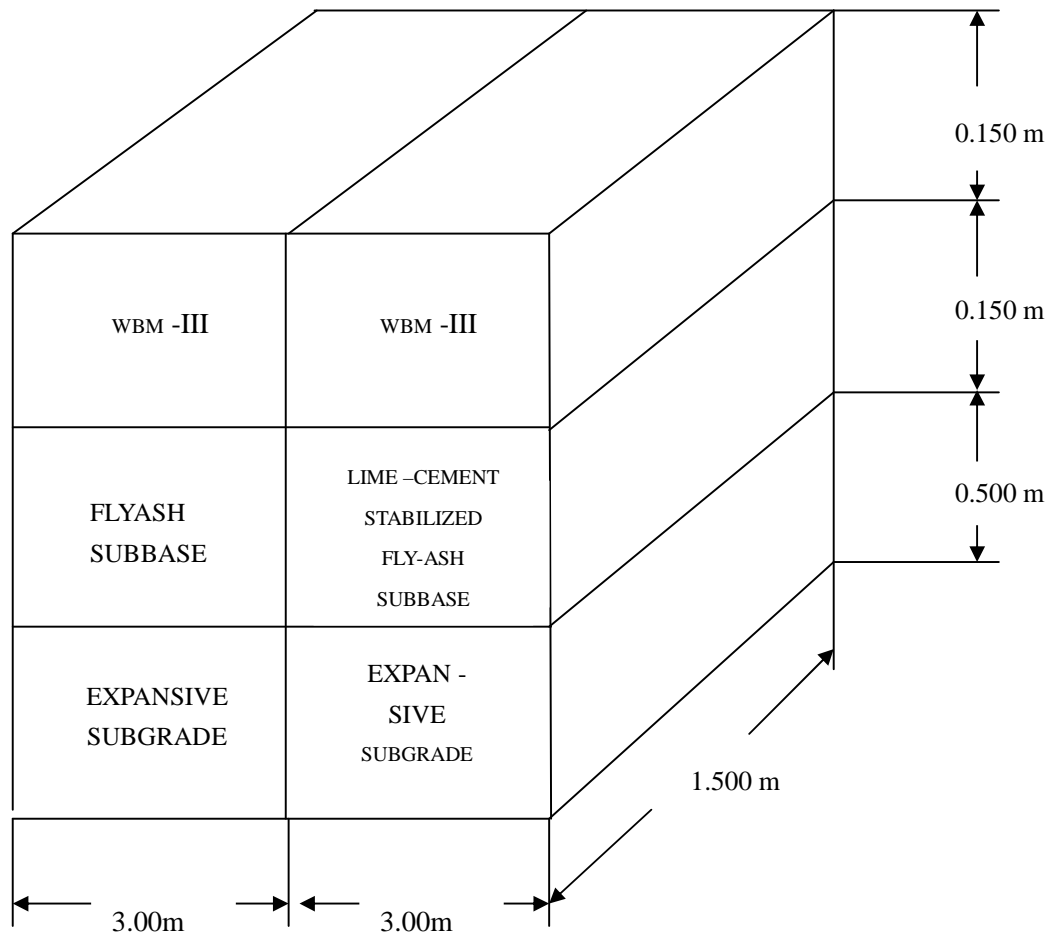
FLEXIBLE PAVEMENT TEST TRACKS ON DIFFERENT SUBGRADES
